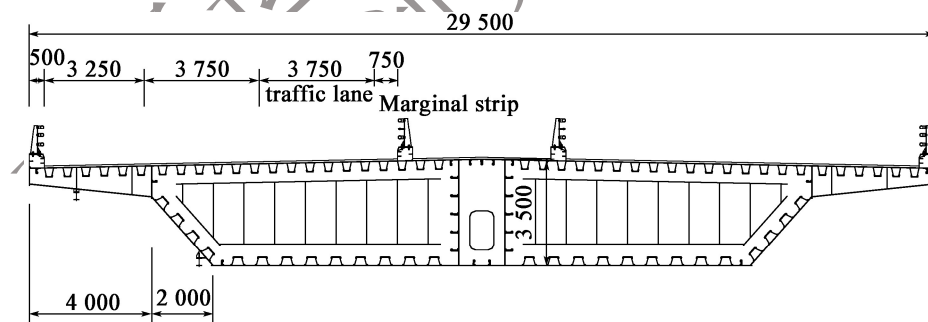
Main girder cross-section of Daxie Second Bridge (Unit: mm)
